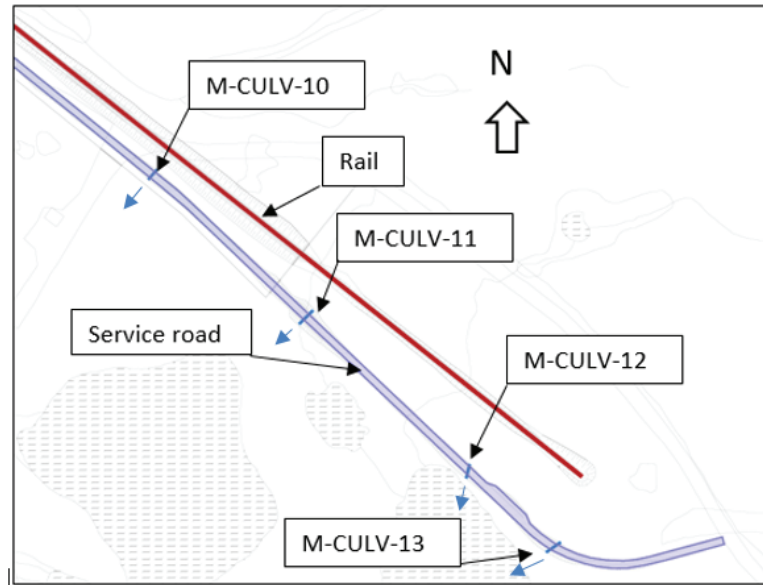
Rail Service & Access Road – Cross Drainage Culverts
